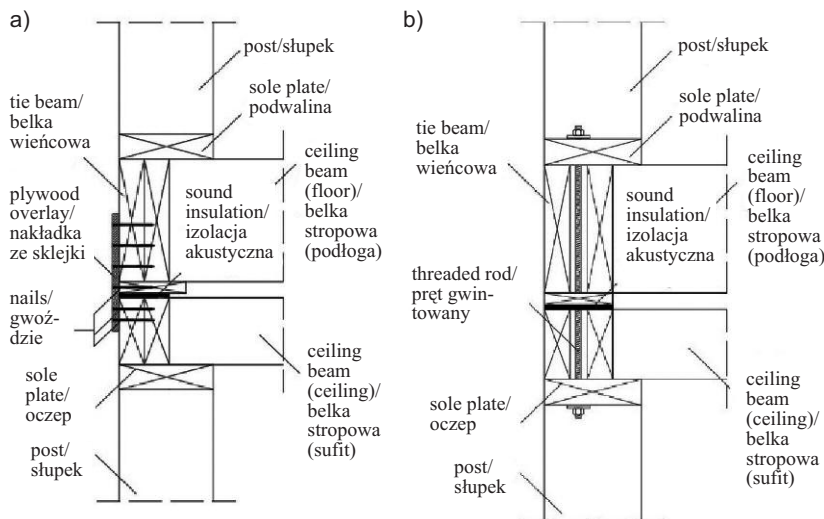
Connections of the walls with the ceiling and the ceiling of the frame module: a) with nails and overlays; b) with screws [5]
